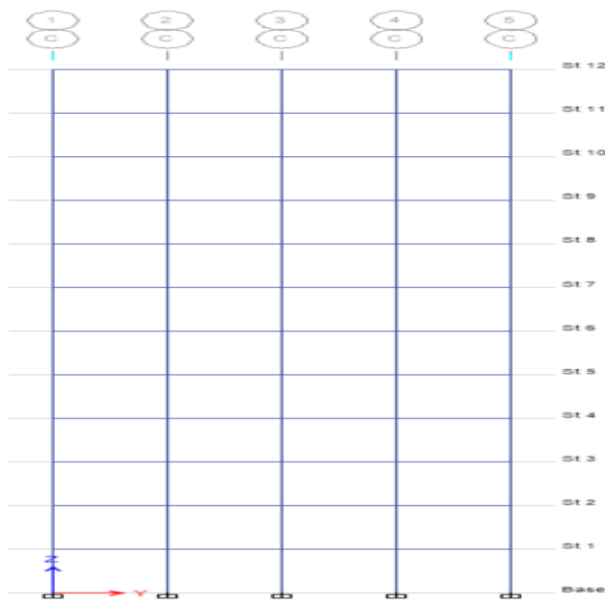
Elevation showing beam and column layout of the building in ETABS 2016.
